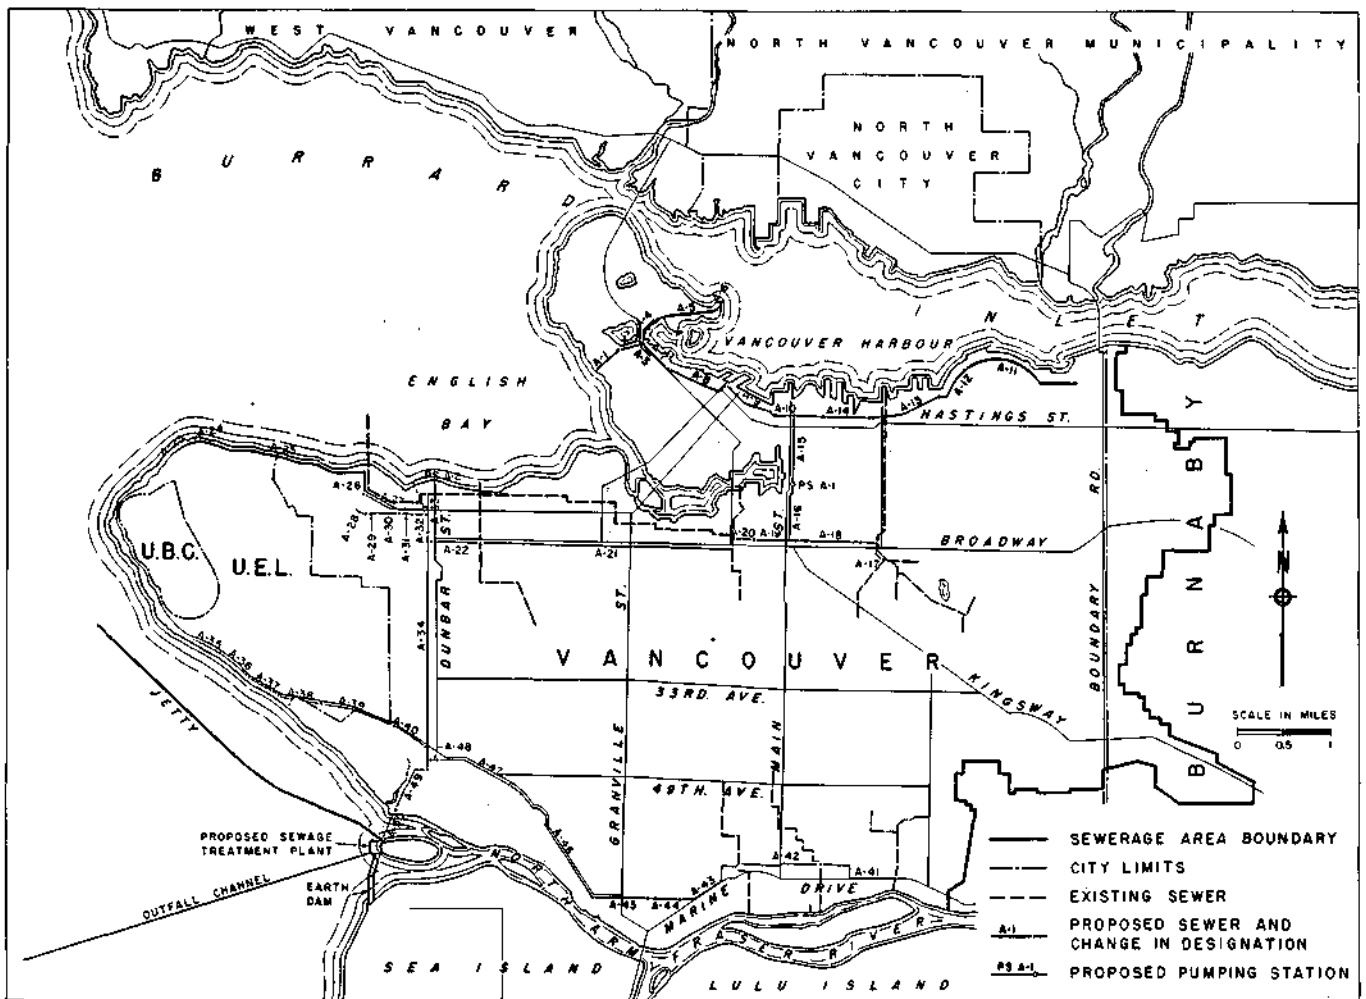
Proposed Layout of Plan A - Vancouver Sewerage Area
